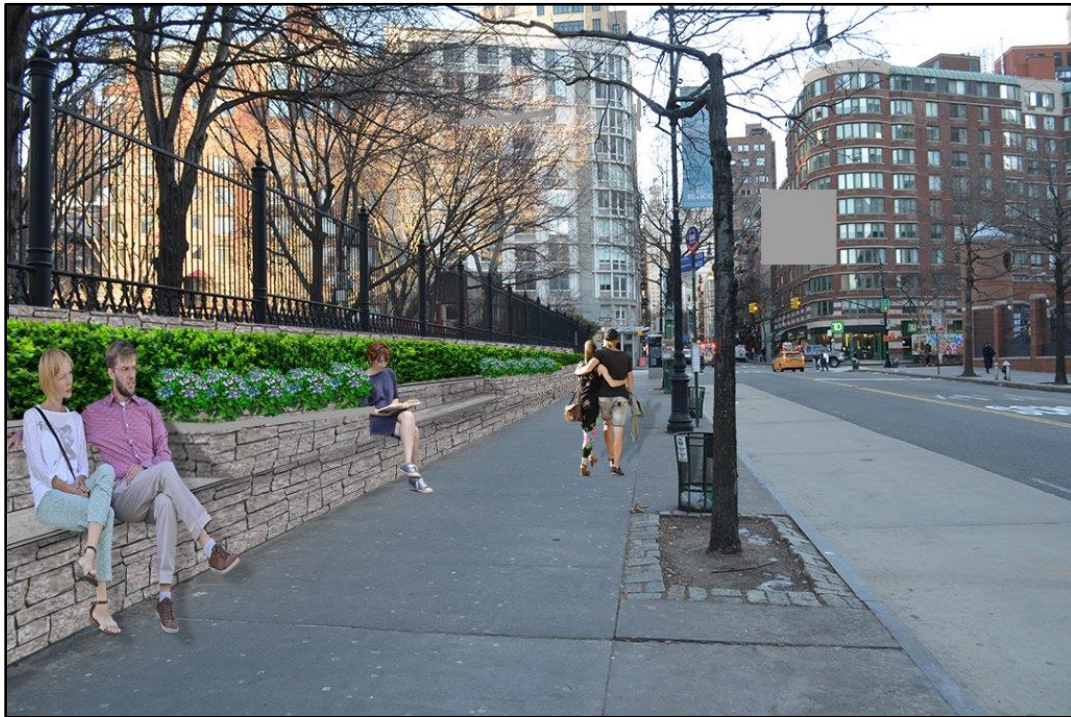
Rendered View of Permanent Barrier/ Sitting Wall Fronting Washington Market Park
